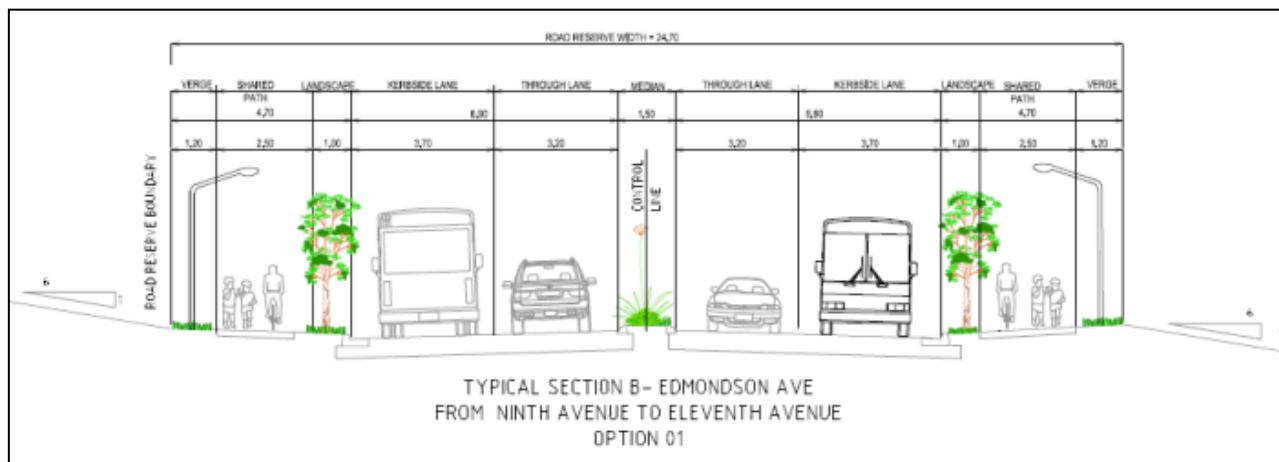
Edmondson Avenue Typical Transit Boulevard Section
